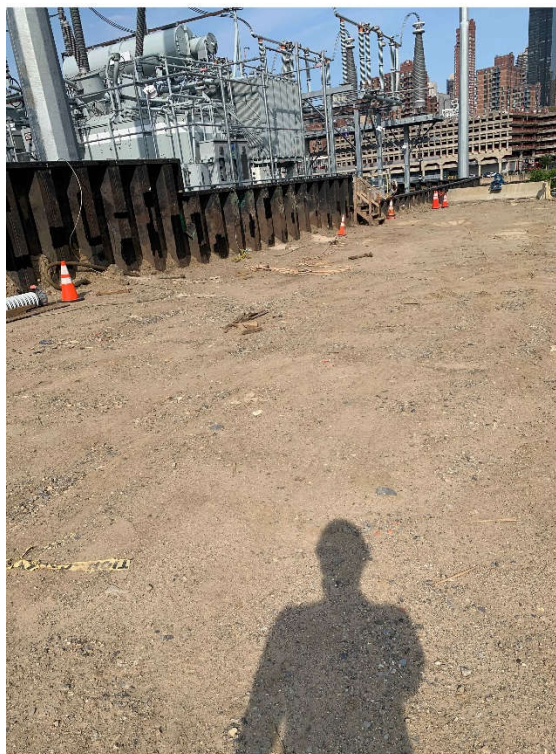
Rainey substation near the East River bank, where the cable route will have a 90-degree turn progressing north, and then east towards the point of view of the photo. View facing west southwest.
